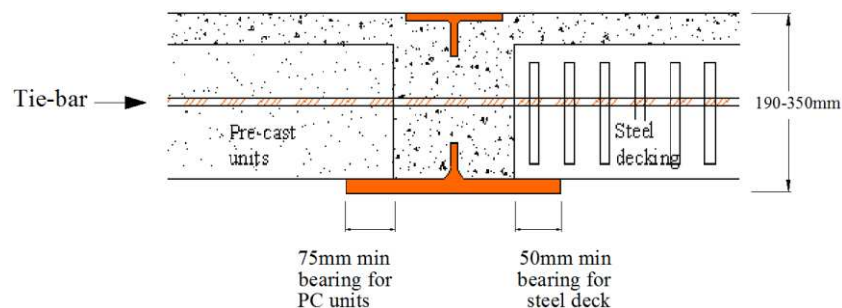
Schematic drawing of the composite shallow cellular floor beam [2]
